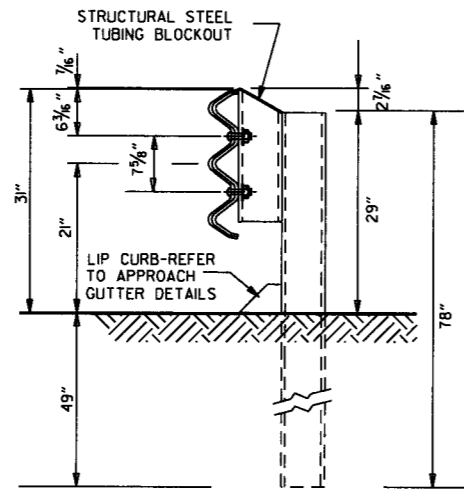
DETAILS SHOWING POSITION OF GUARD RAIL ON HIGHWAY
